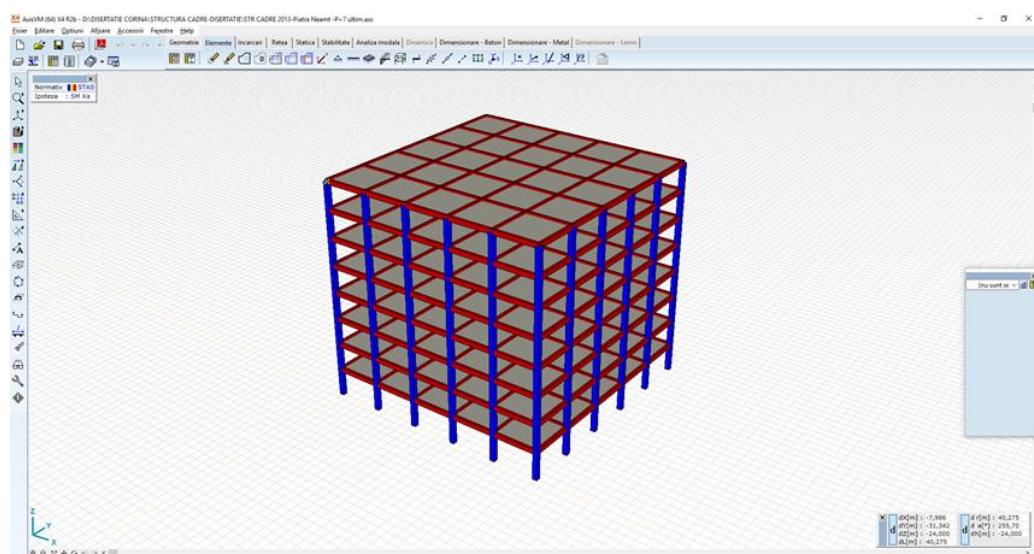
Analysed symmetrical structure - reinforced concrete frames
